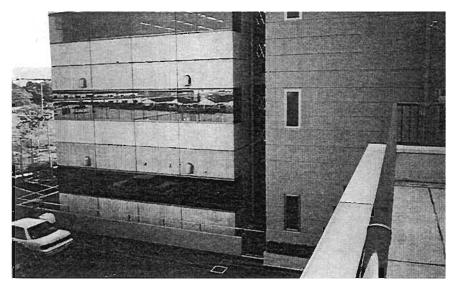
The MTRC (base-isolated RC building frame building on the righ and expansion joints in be
